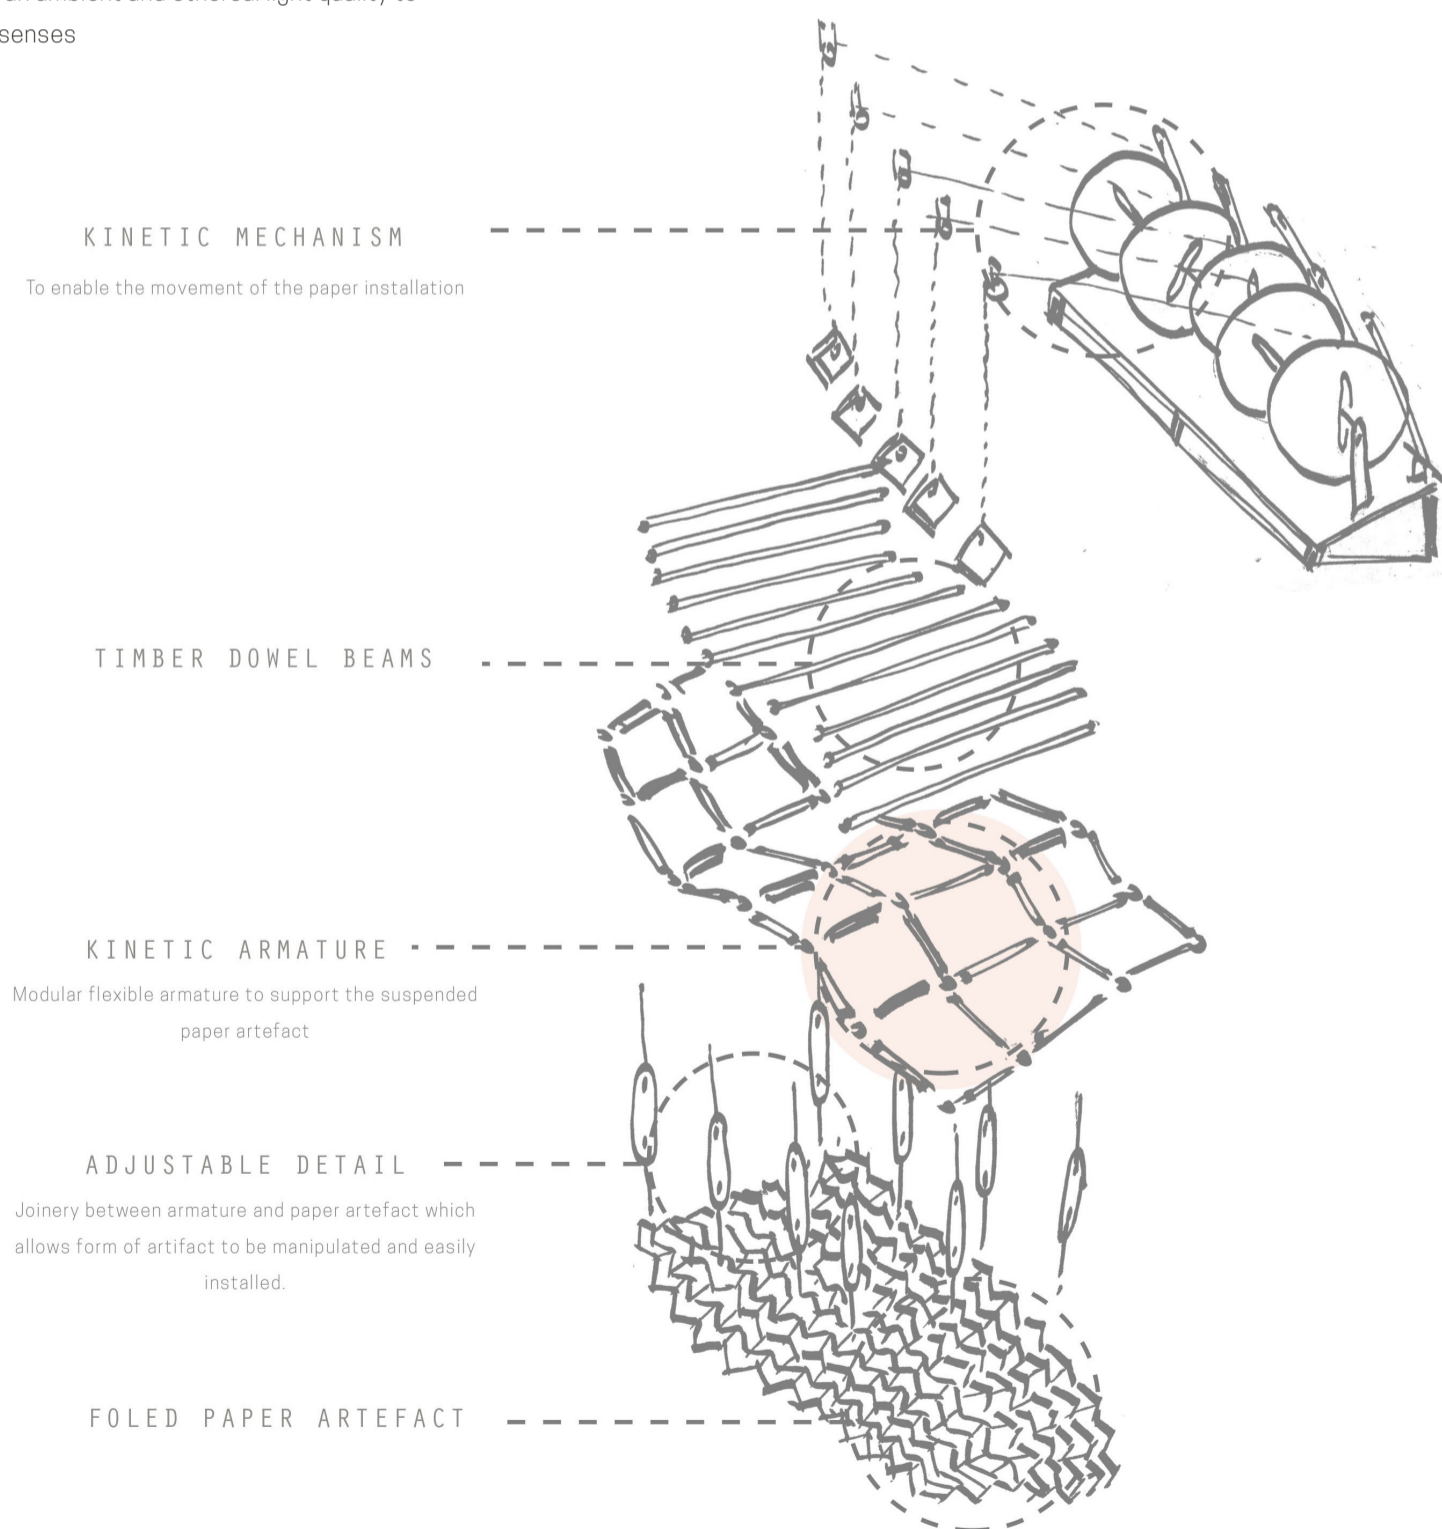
Suspended installation diagram (Author. 2016)
